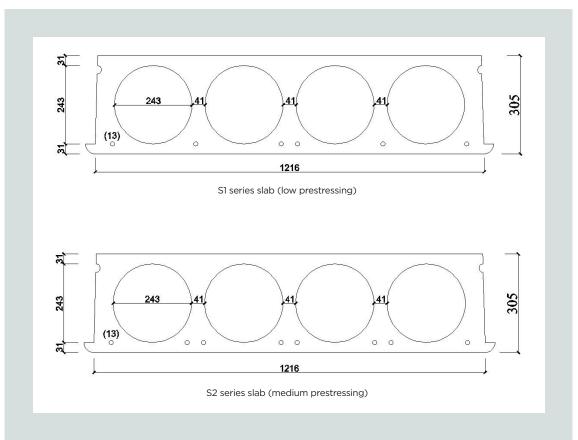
Cross section of S1 and S2 series full-sized prestressed concrete hollow-core slab specimens. Note: All dimensions are in millimeters. 1 mm = 0.0394 in.
